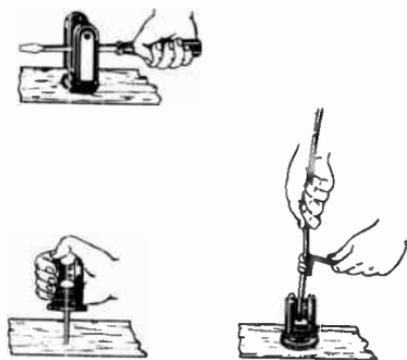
The service attachment is fastened to a pole or building, and the service drops are connected to it.
